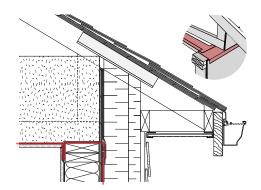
Roof-to-wall exterior air barrier redline detail (annotations not shown).
